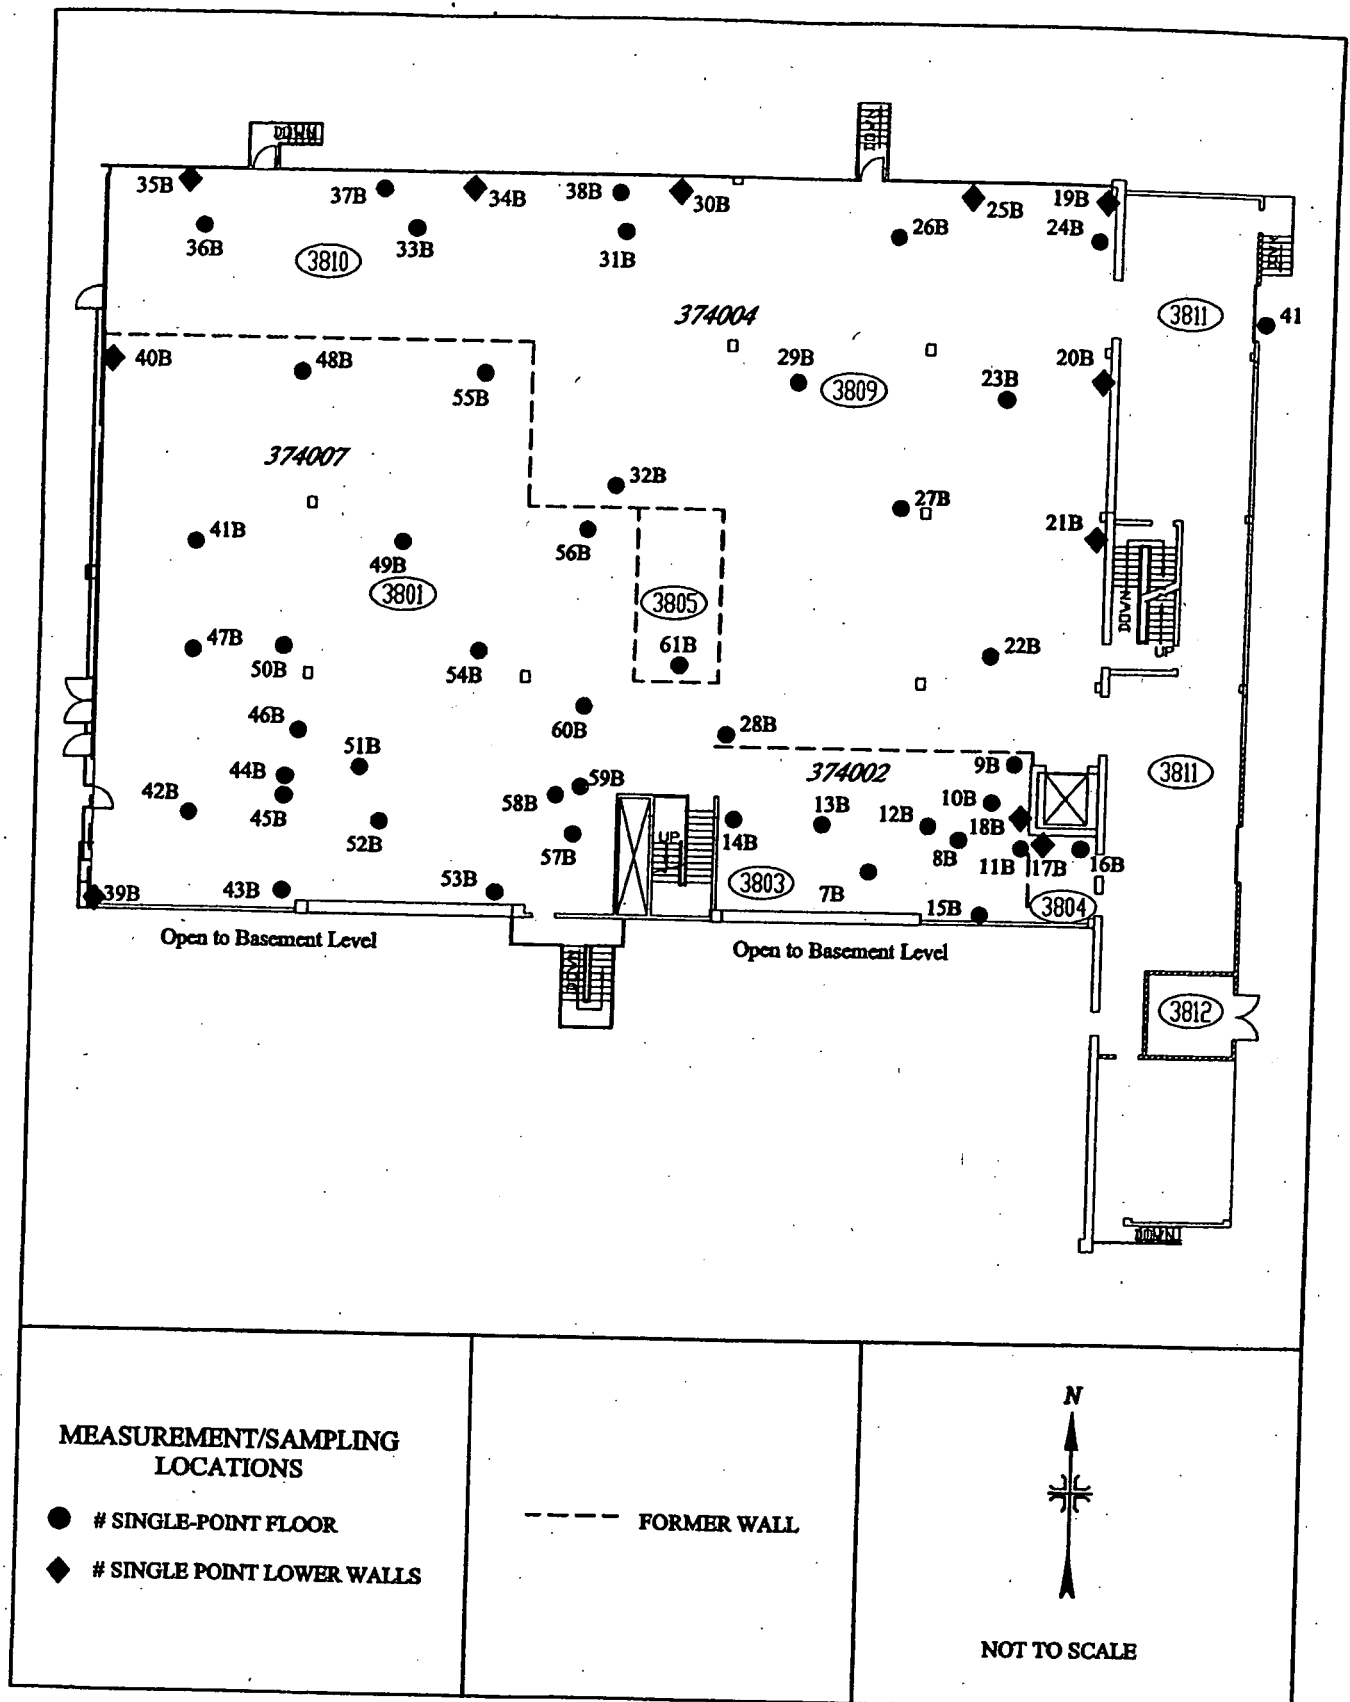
Ground Floor Level - Lower Walls and Floor - Measurement and Sampling Locations
